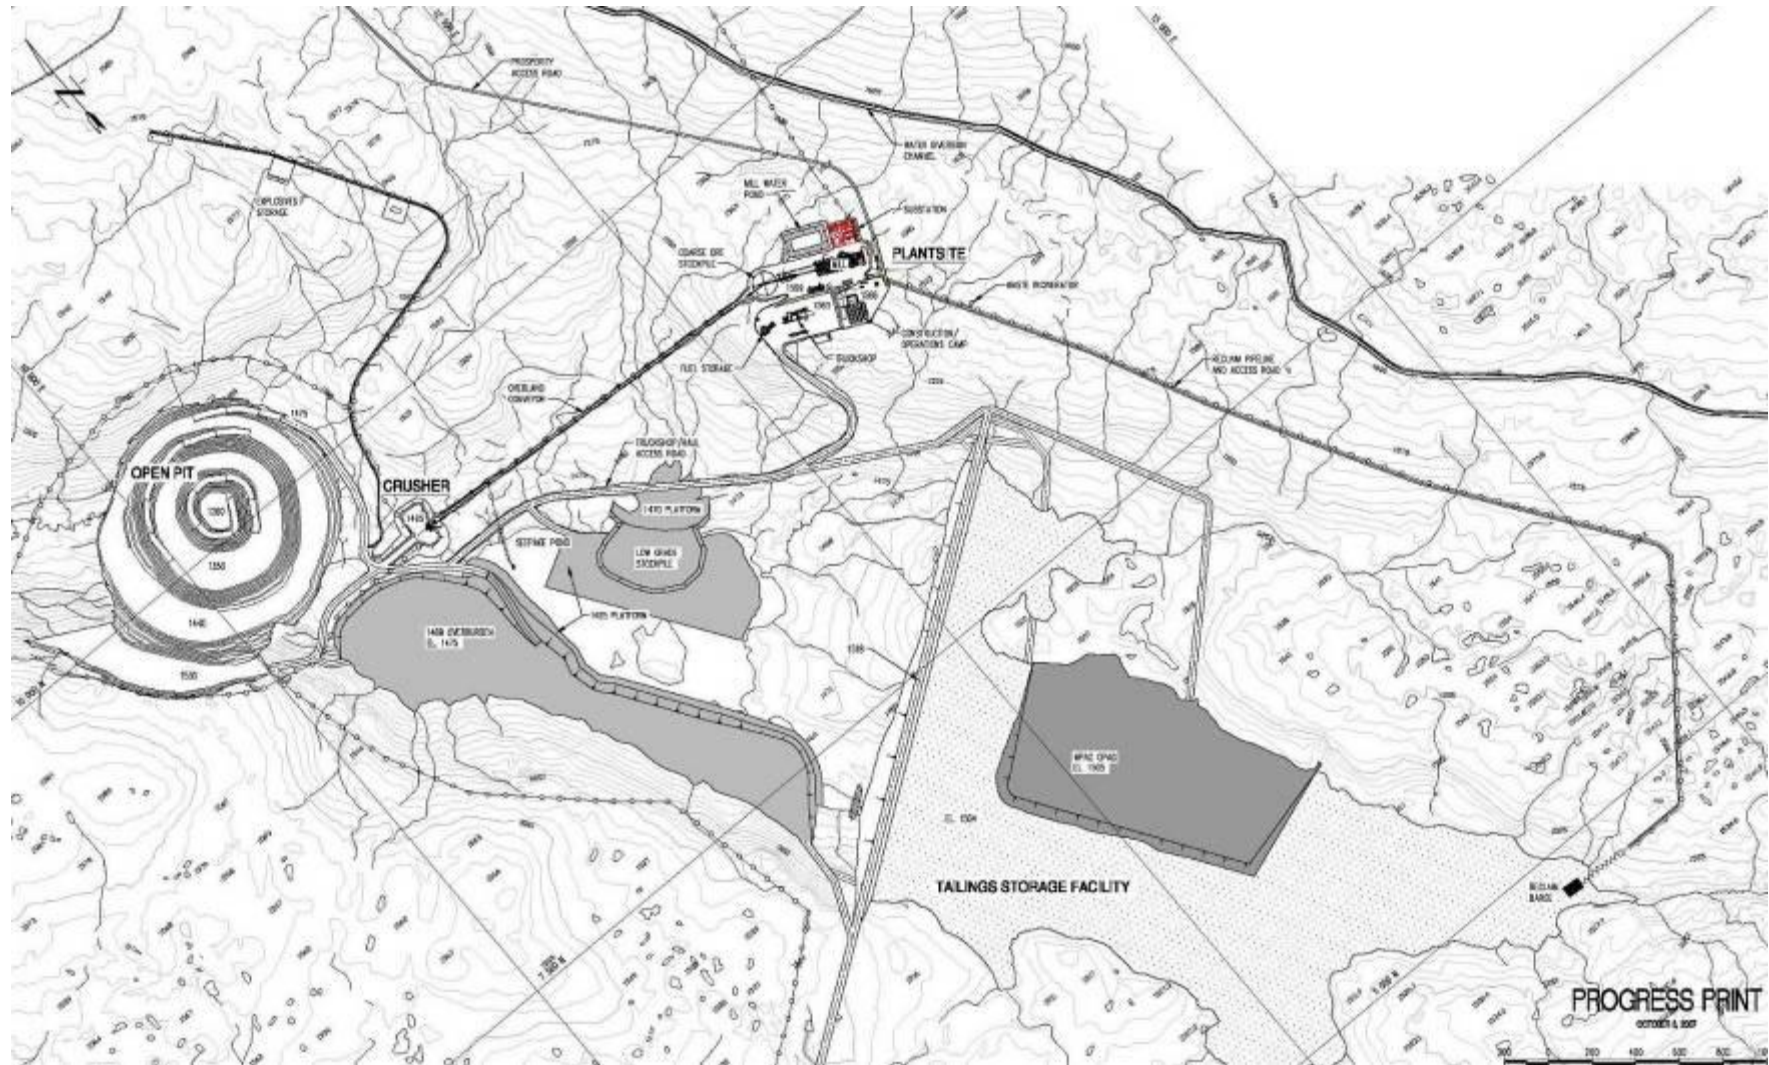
Pit and Stockpiles Plan—End of Year 3
